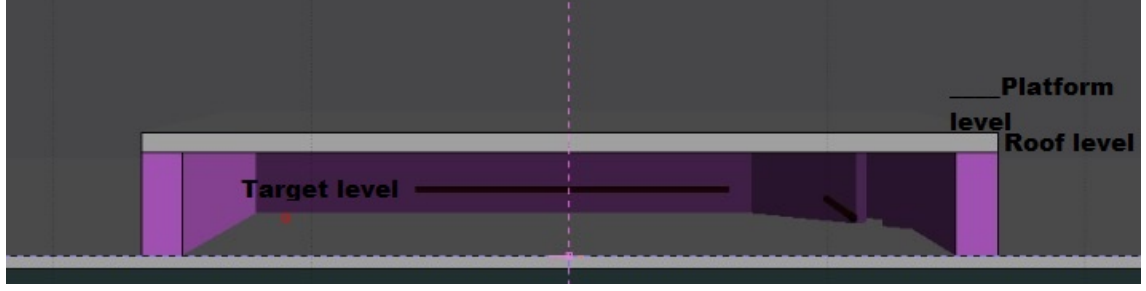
Elevation view of the accelerator room with the concrete roof.
